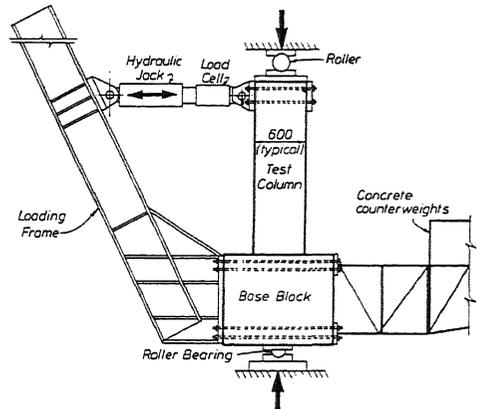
Loading arrangements for quasi-static cyclic lateral loading tests on column canterlevering from base block within a testing machine.
